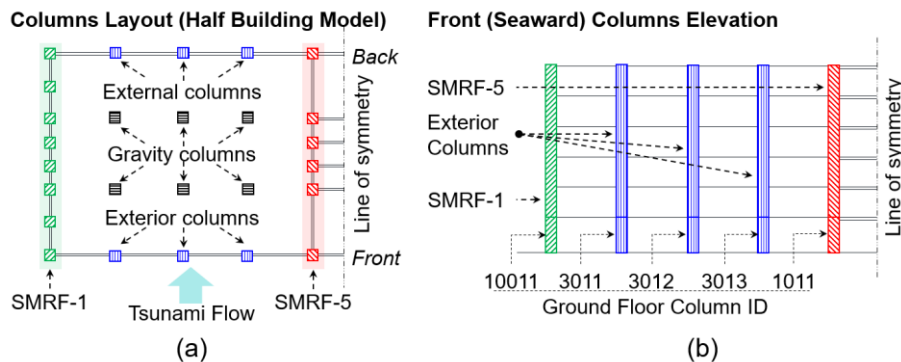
Main structural components for half of case-study building: (a) plan layout; and (b) elevation
